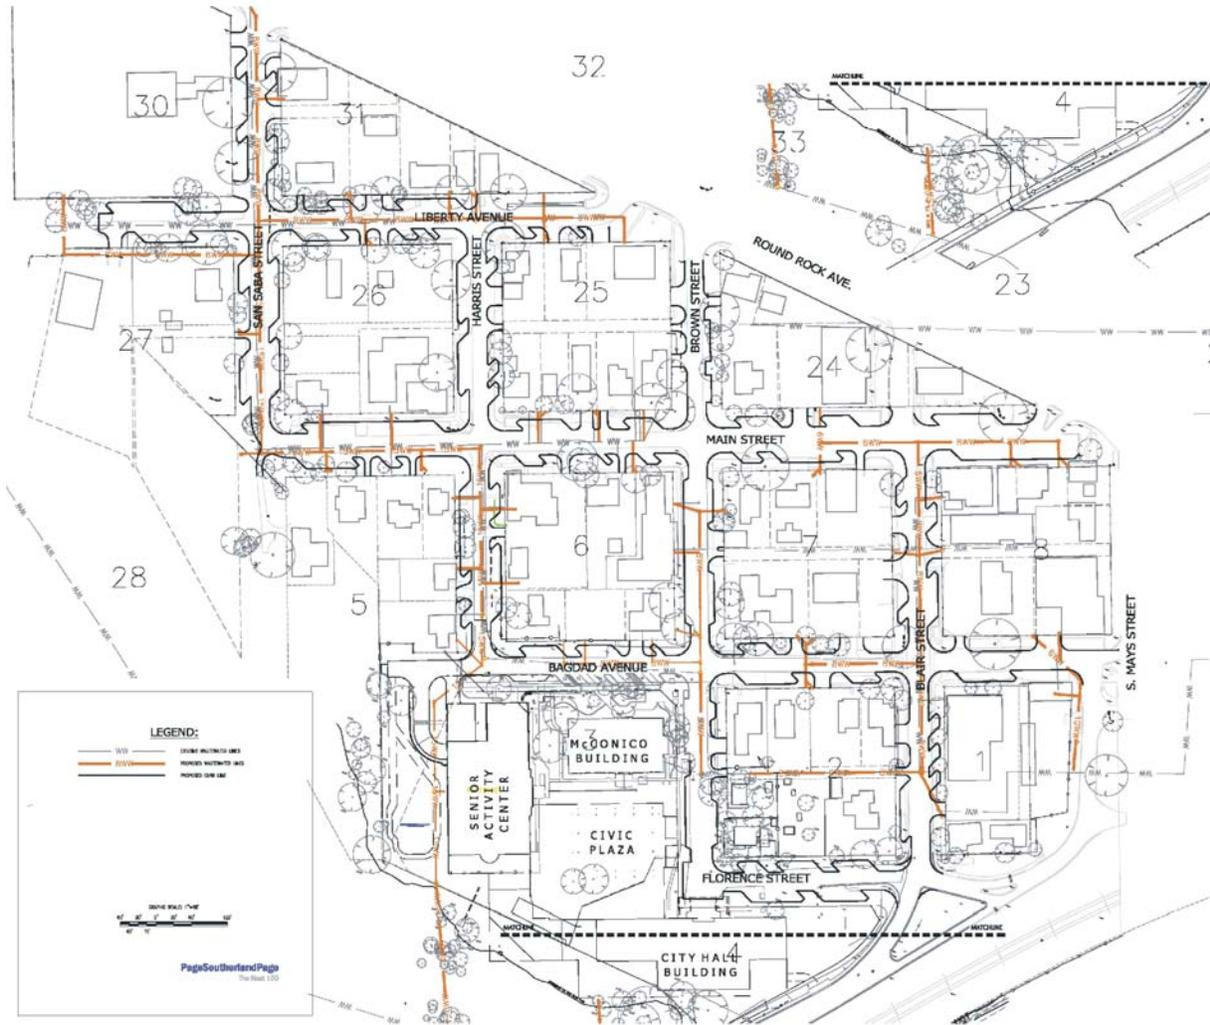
Current and Proposed Southwest Downtown Wastewater Plan. Gray lines indicate existing wastewater lines; orange lines are proposed lines. Overall capacity in the Plan Area will be increased. Tree roots and other impediments may warrant minor modifications to the wastewater plan. *Illustration: PageSoutherlandPage.
